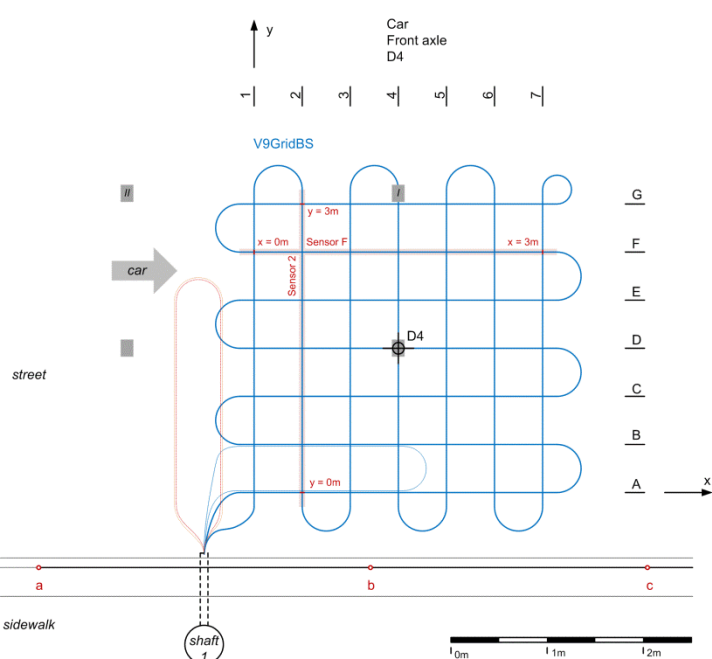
Footprint of the car in tests using the front axle with sensor V9GridBS
